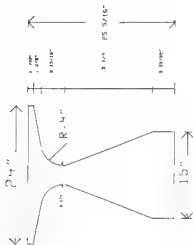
Cross-Section of Modified Bulb-Tee Girder
